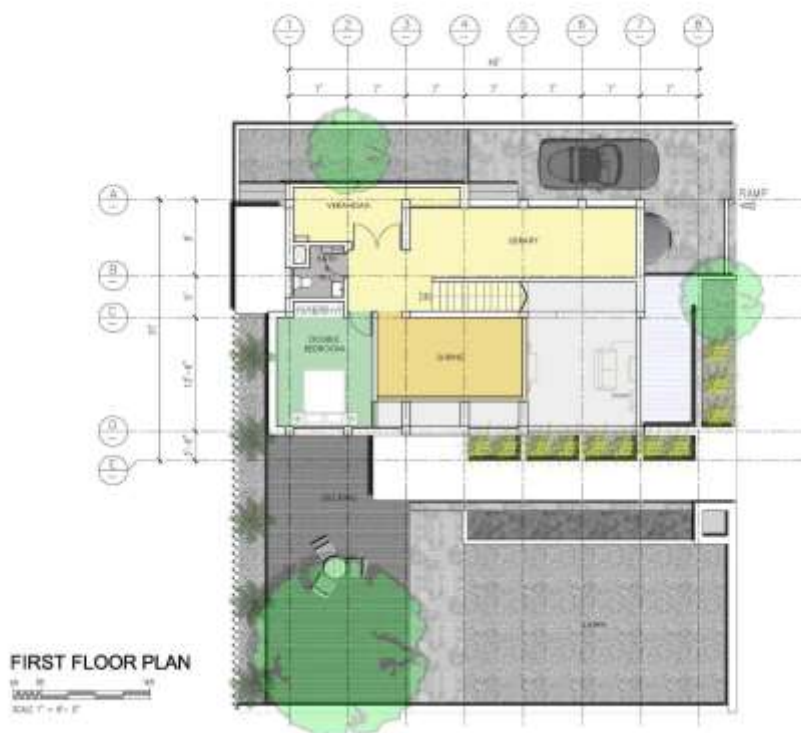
First Floor Plan of Case Study House [Modular Architects: (2015)]
